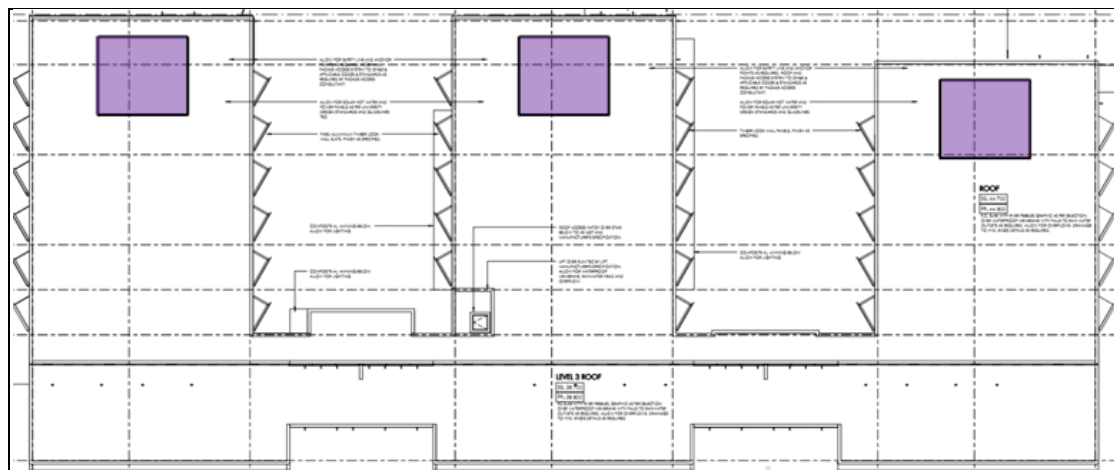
Proposed Roof Plan (Nettleton Tribe Partnership, 2014)
